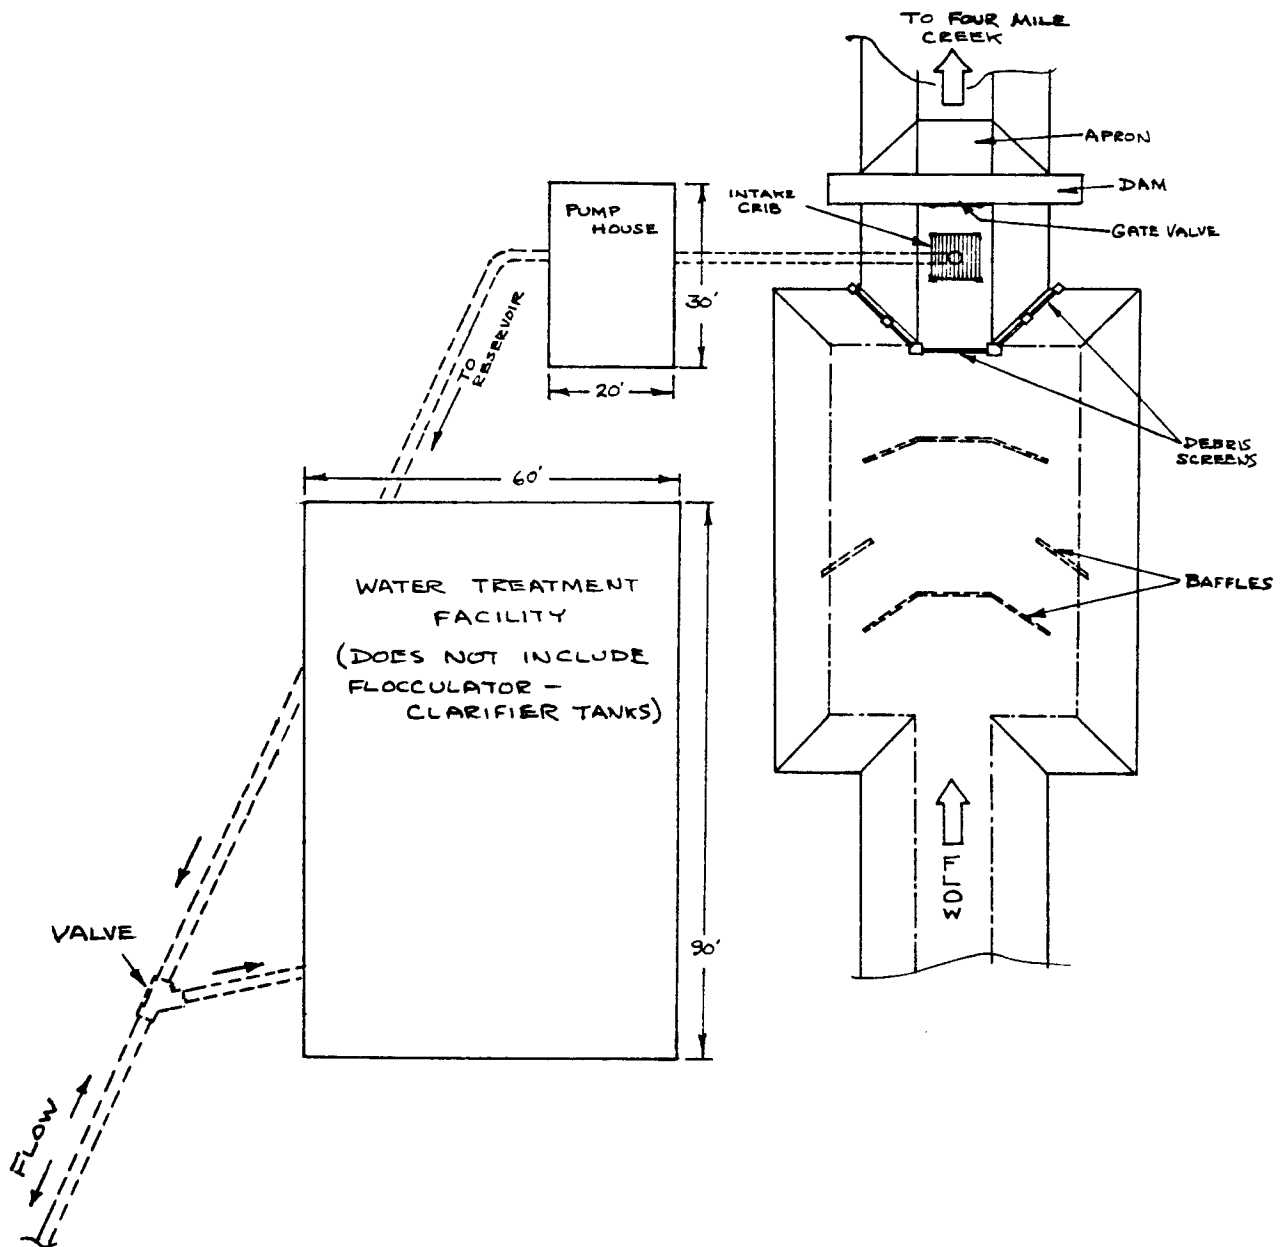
CONCEPTUAL LAYOUT OF SETTLING BASIN, PUMP HOUSE AND WATER TREATMENT FACILITY
